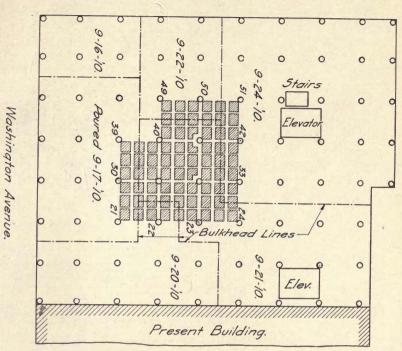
PLAN OF FLOOR SHOWING LOCATION OF PANELS TESTED.
